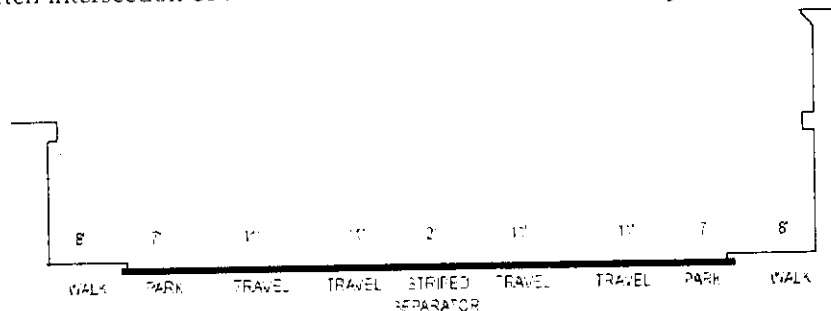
Cross-Section 50 Feet West of Main Street, Looking West
